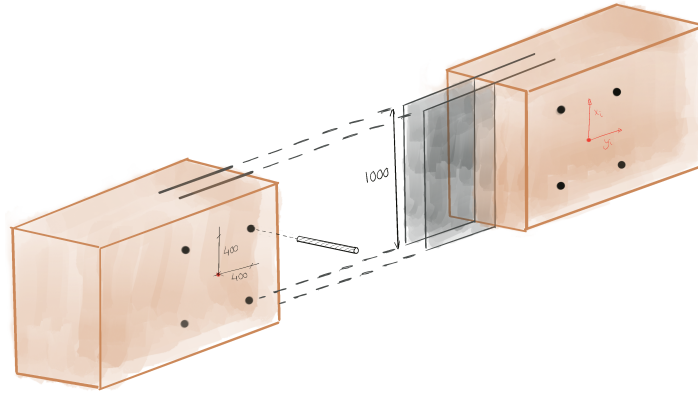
Slotted-in steel plate connection, assumption for global design. Dimensions are in mm.
